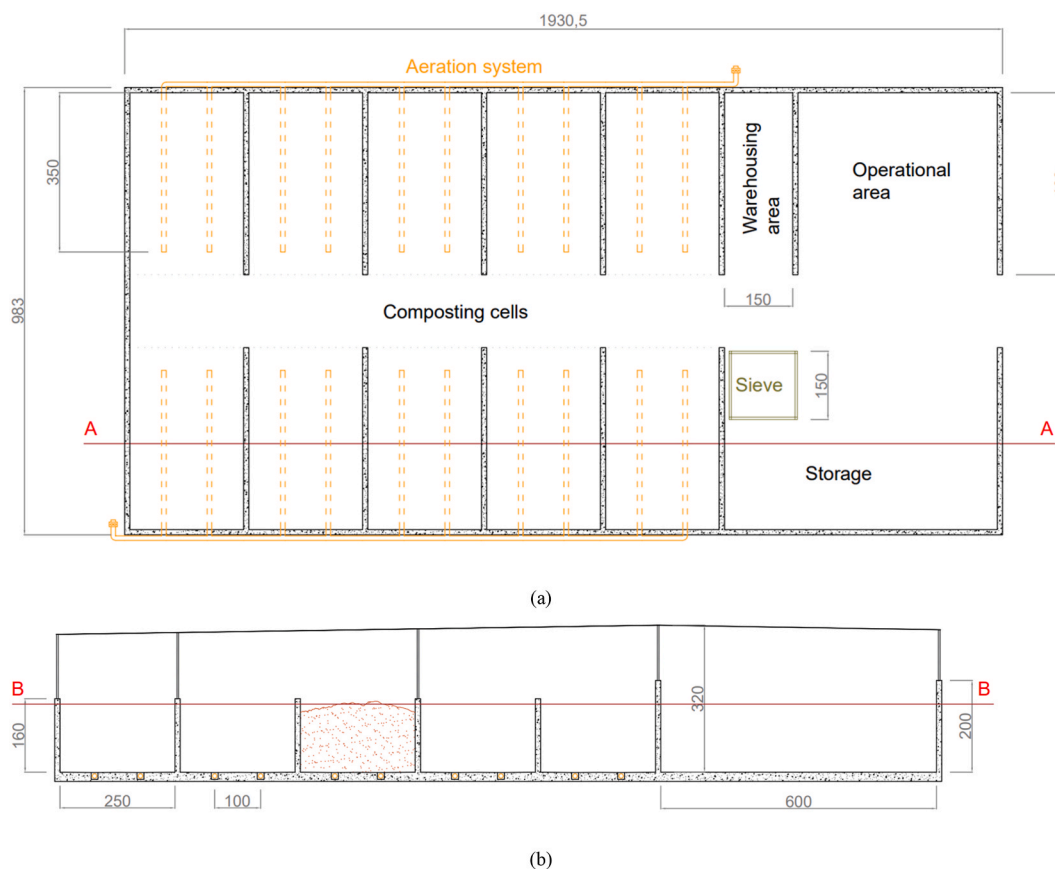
Composting plant design: (a) Layout (BB section) and (b) cross section (AA section) – Scenario S1. Measures in centimetres.
